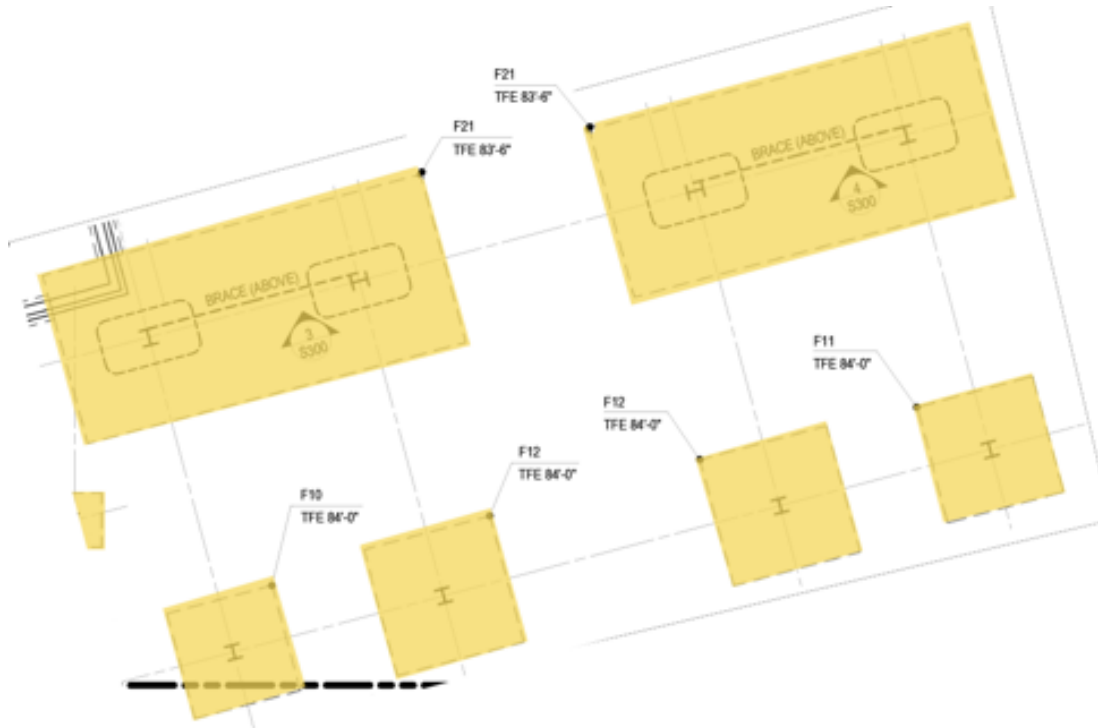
Typical Bed Tower Bay Foundation Plan (original image provided by HGA)
